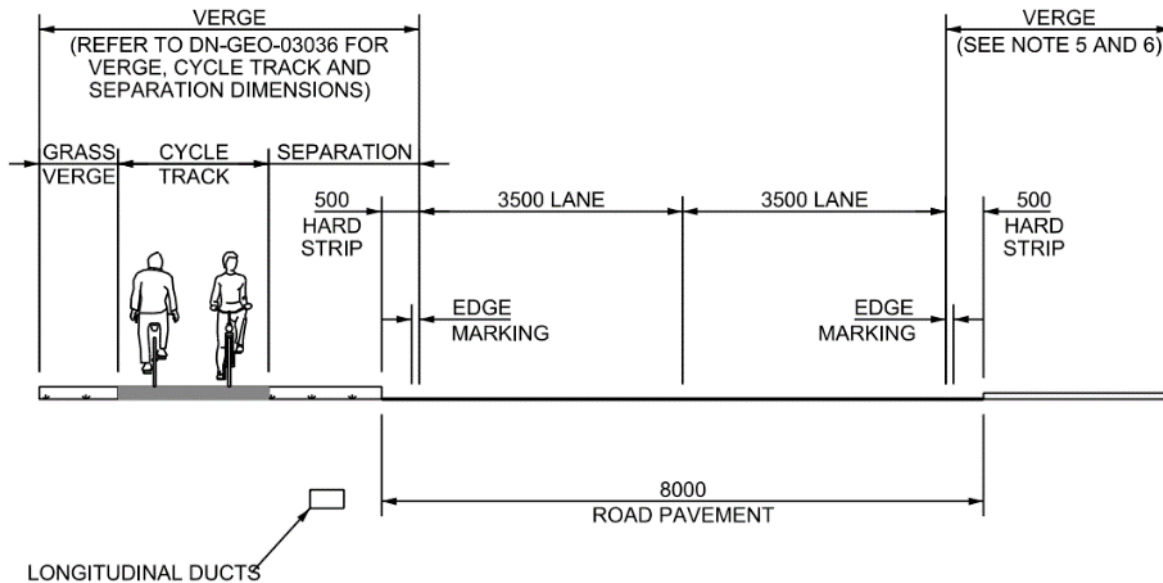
Type 2 Single Carriageway Cross Section (DN-GEO-03031)
